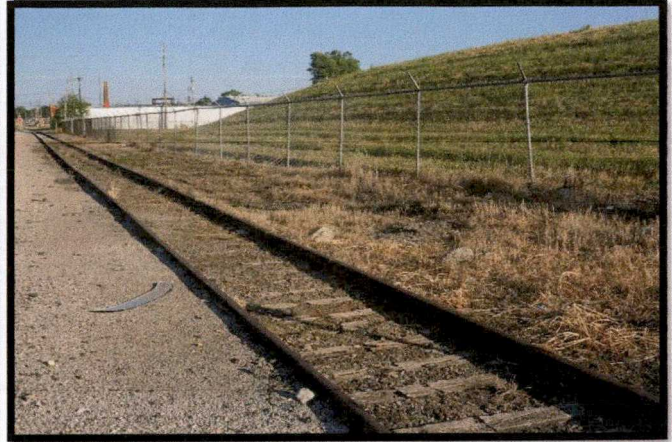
Warning sign, fence along railroad tracks and 16th Street.
